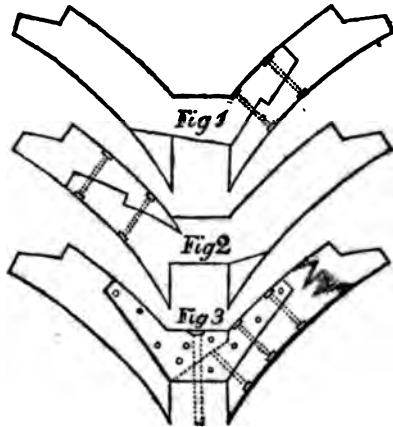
is similar, but more out-square, consequently easier to be obtained.
